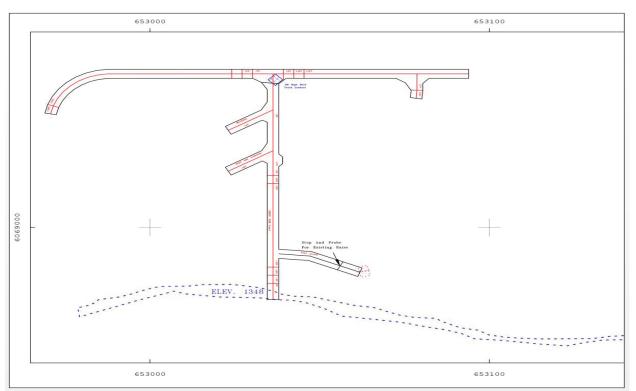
1348 Stope Access Plan, 1348 Level Stopes
